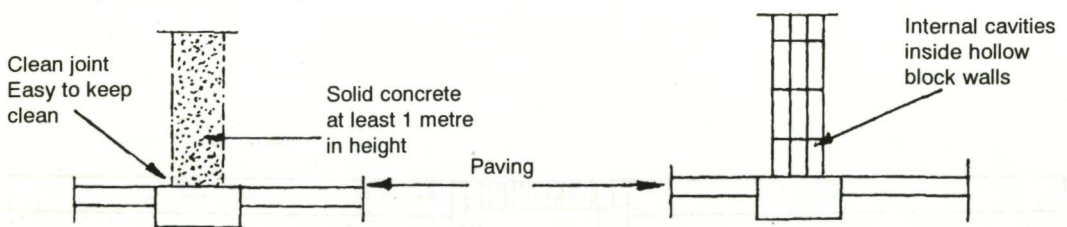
Solid concrete wall (left) and hollow block wall (right)
